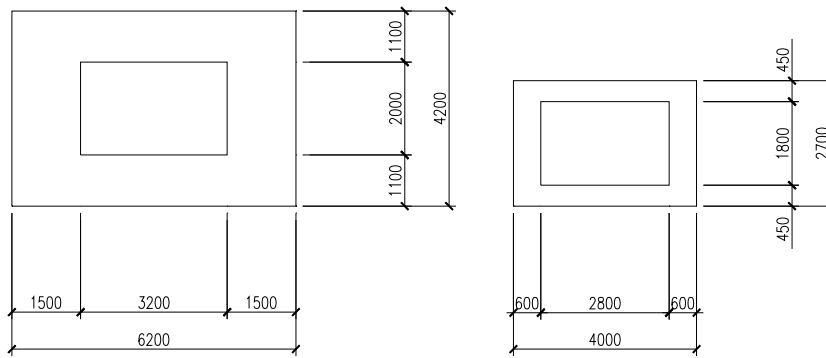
Cross-sections of the arch at the abutment (left) and near the crown (right).
